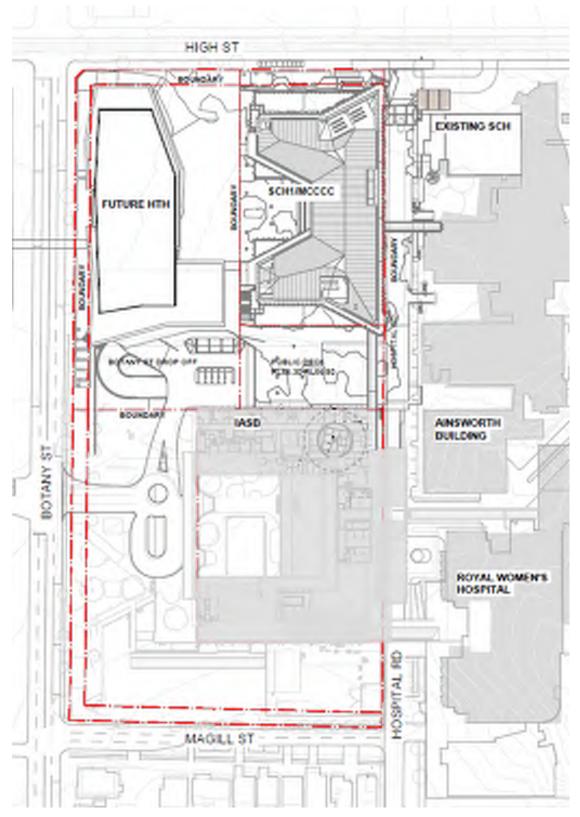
Basic site plan showing the SCH1/MCCCC building and surrounding sites, including the future HTH building (John Holland)
